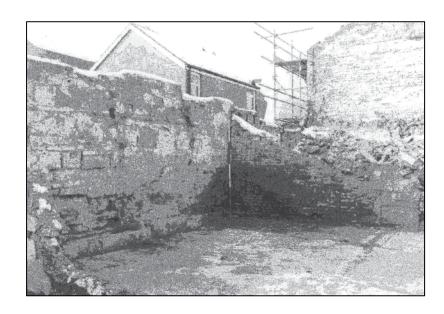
Building C, N GF room after partial demolition, looking W (photo 9/18).
